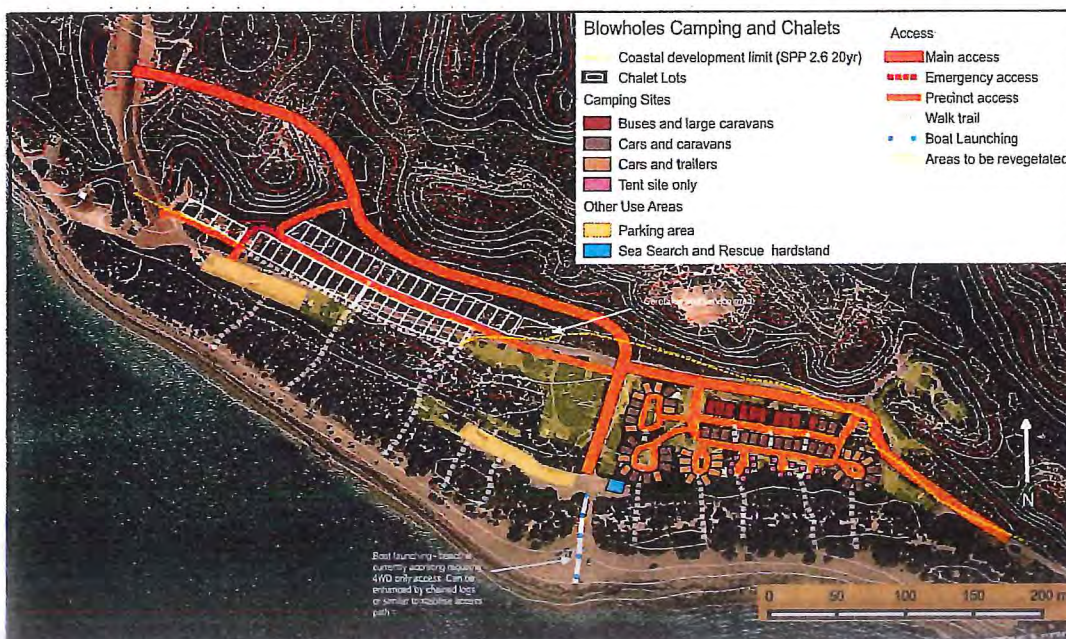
A. Blowholes Camping and Chalets Layout Plan
